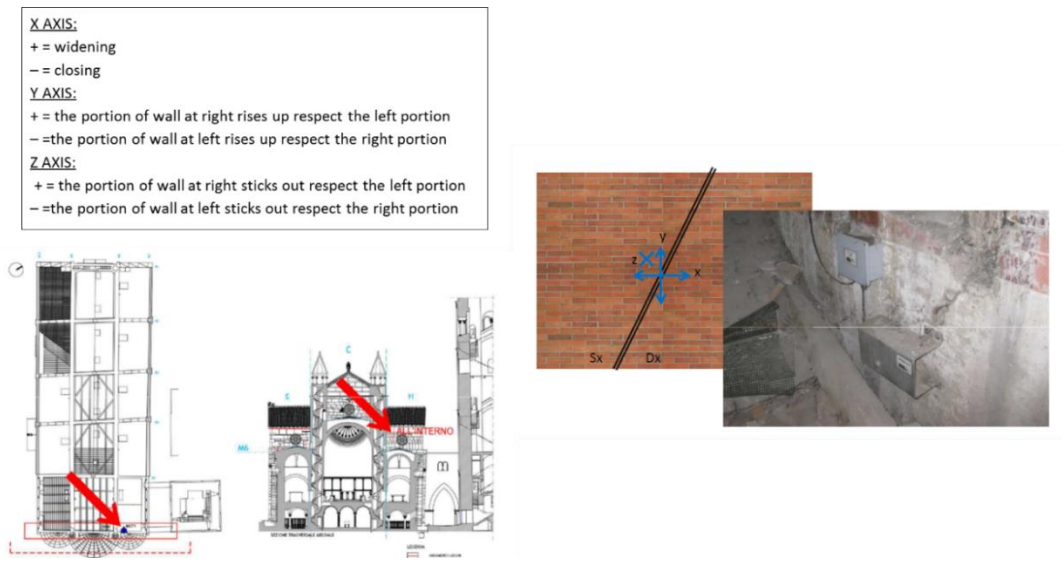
Triaxial joint meter installed in the longitudinal wall of the Cathedral (MGT1)
